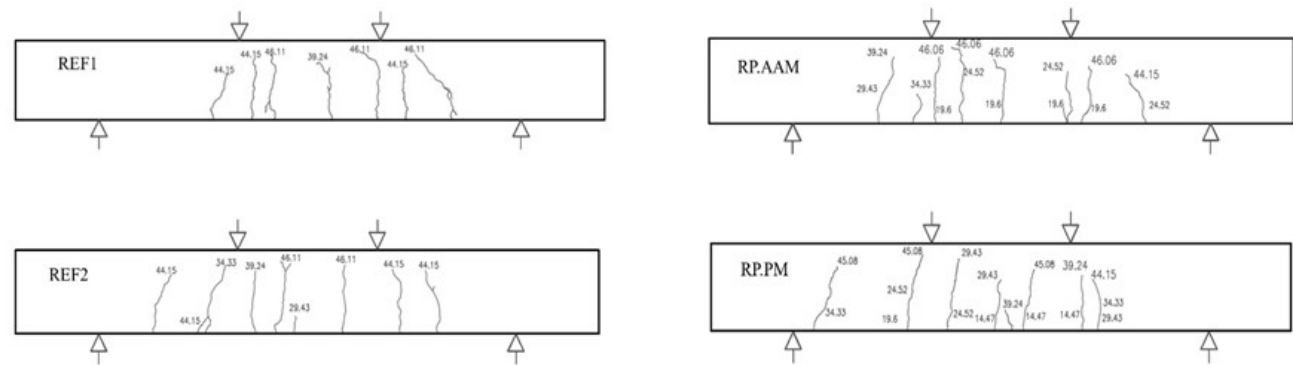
Crack patterns and failure mode of beams (units in kN). Source: Authors
